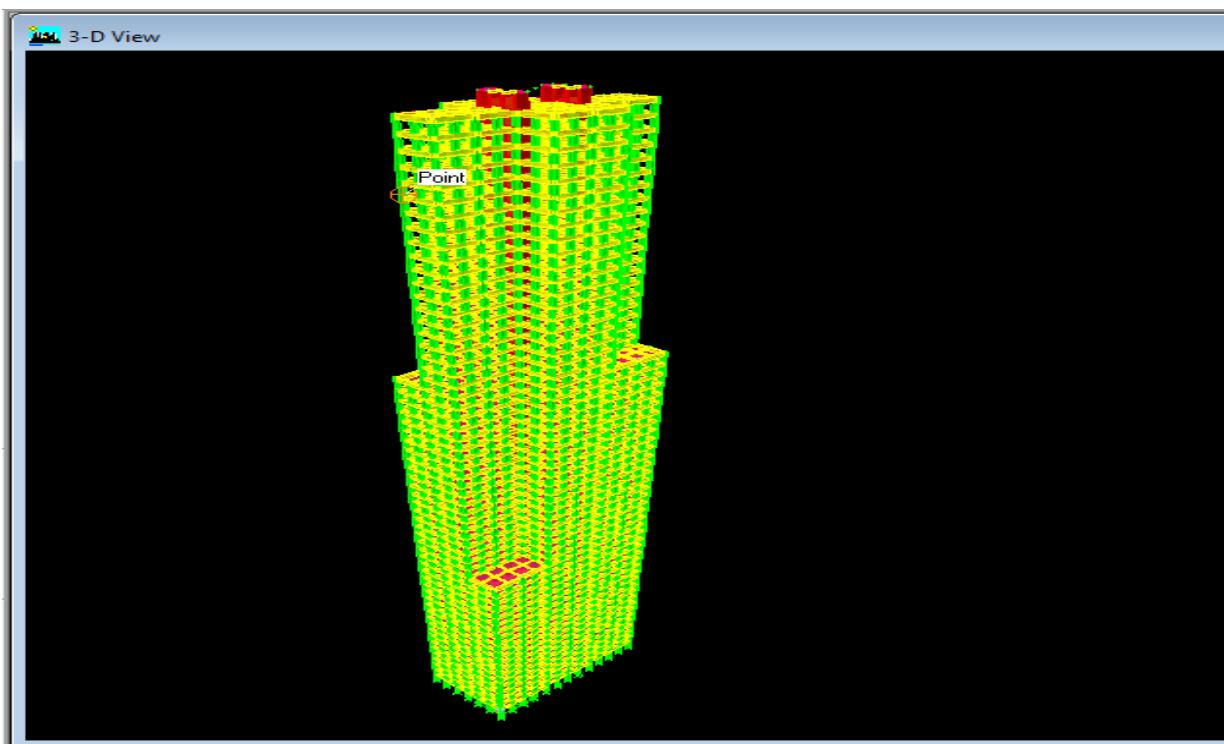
(b): 3-D view of 60 storied Bundled Tube structure building
